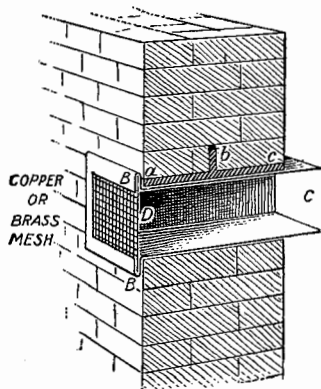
Method of Constructing Wall Duct in Direct-Indirect Heating
